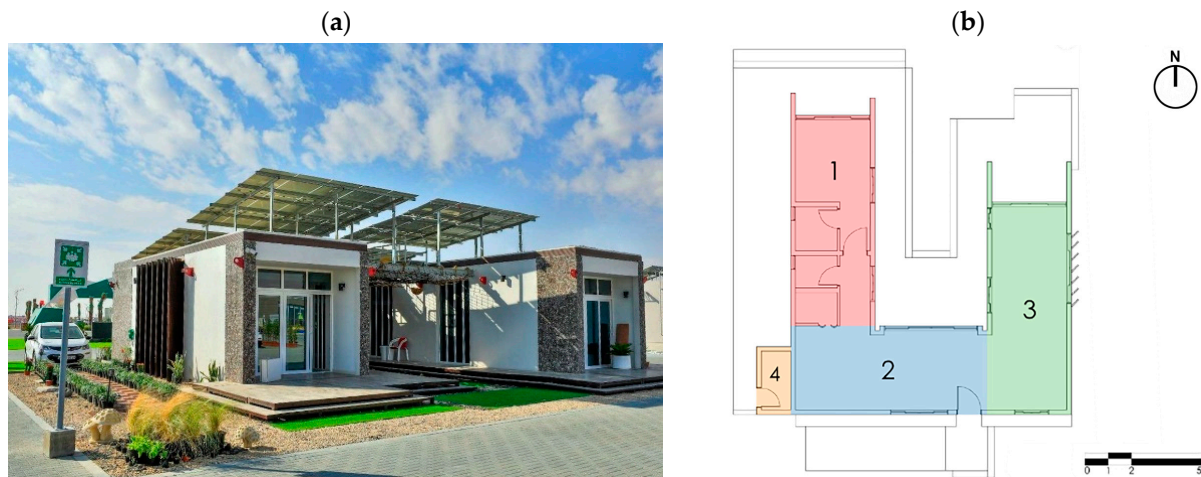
Team KSU's house. (a) Exterior photo. (b) Floor plan—1: bedroom, two bathrooms, storage; 2: kitchen, dining area; 3: entrance, living room, workstation; 4: technical room. (Photo: SDME 2018 Organization. Floor plan: by authors based on the teams as per drawings).
